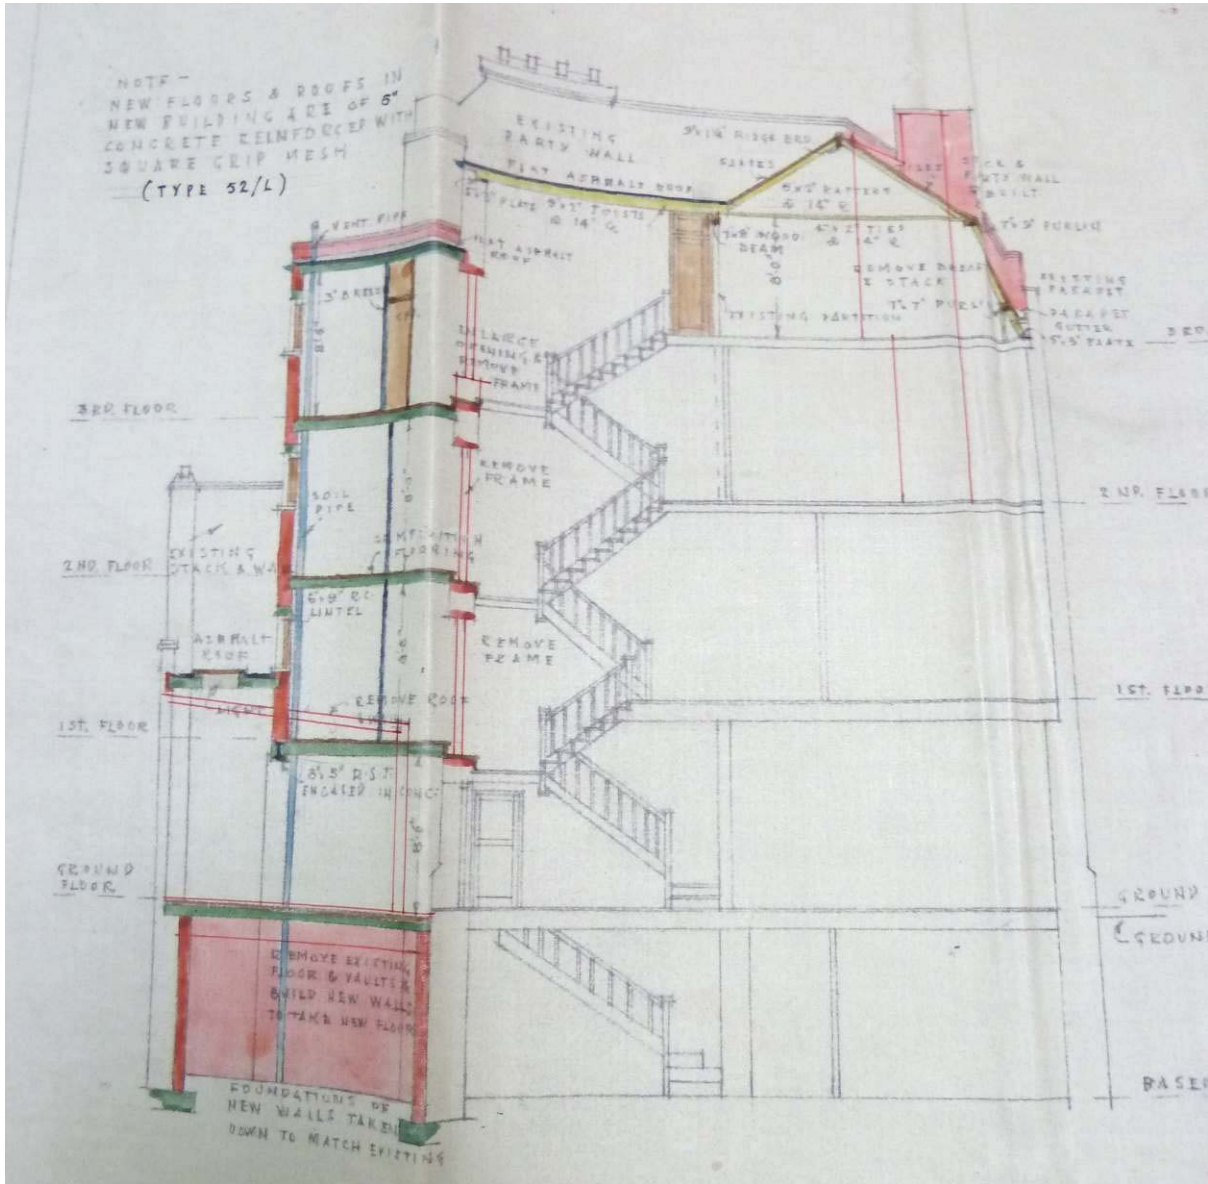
Proposed section, J. Mackie Murray ARIBA in conjunction with Lawrence Farman FRIBA, February 1947 (LB Camden, planning file)
